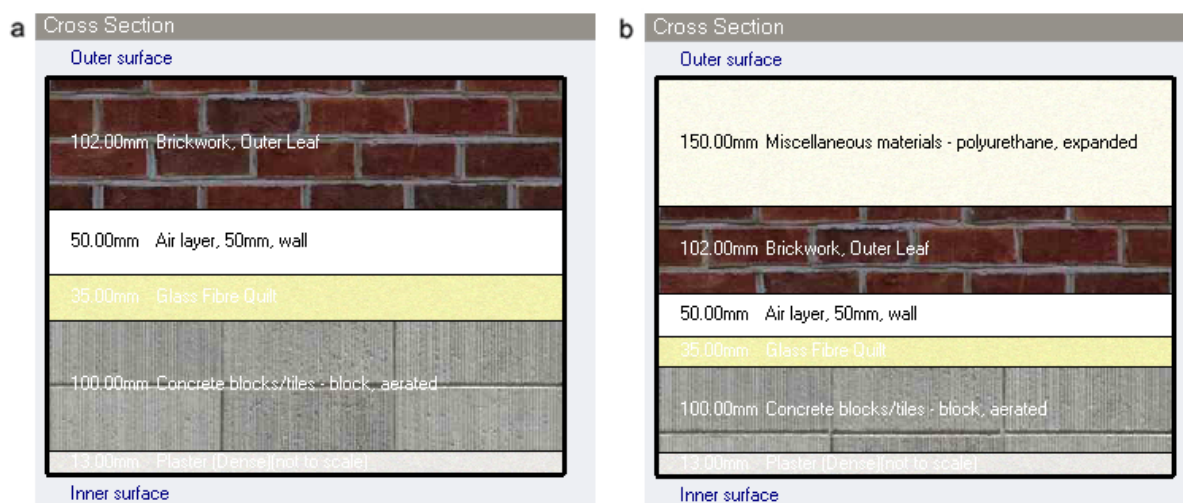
(a) current external wall of the Conventional House; (b) estimated retrofitted external wall of the Conventional House.
